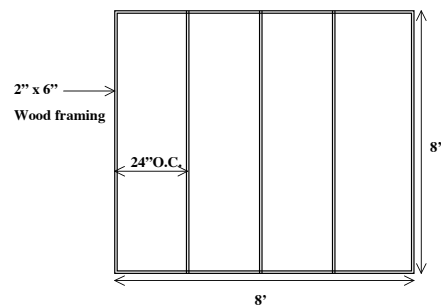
Full size 8’ x 8’ wall sections were built using 2 x 6 wood framing 24” o.c. (Note that 89% of the surface area of the wall is insulated with “R-19” labeled batts and just 11% is wood framing.)
